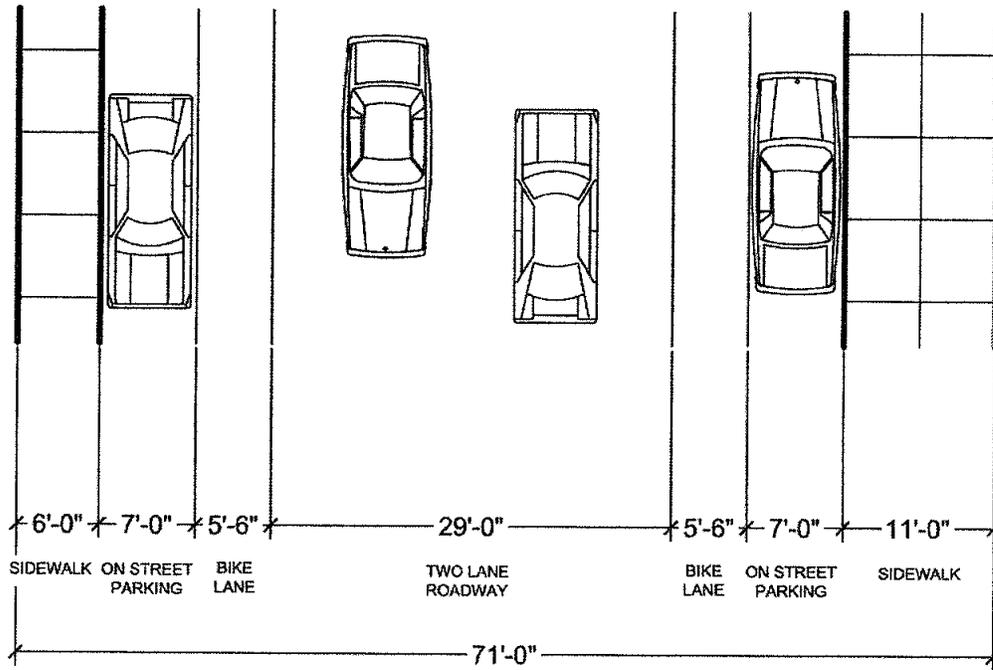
Typical Downtown Core Area Roadway Reconfiguration
